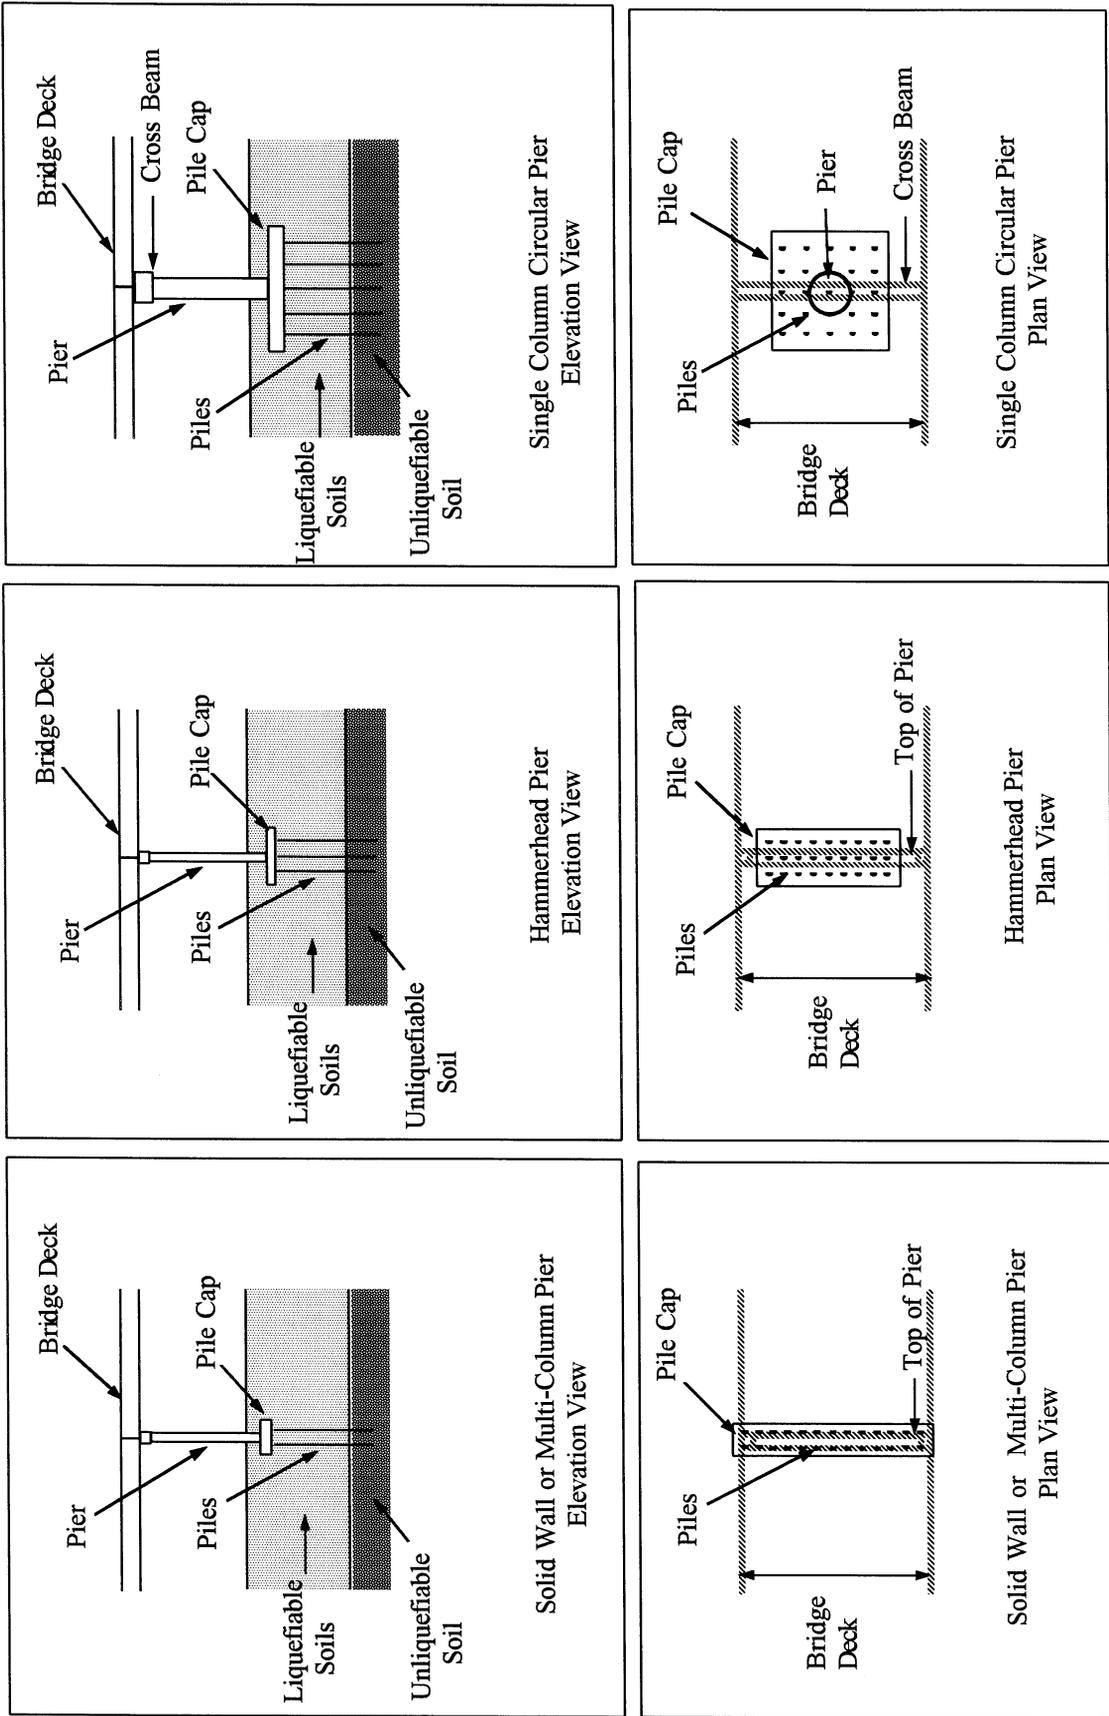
Some Typical Bridge Piers (from Mitchell and Cooke, 1995)
